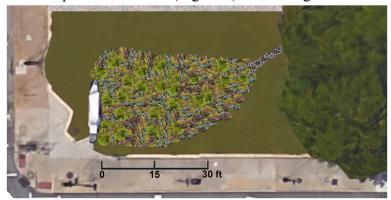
Aerial view of the proposed rain garden showing existing trees and sign and a proposed granite sitting ledge next to the living wall (not shown).
